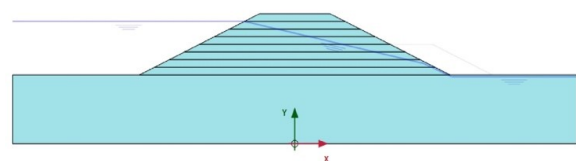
Pattern of phreatic level in road embankment adopted for 7 m high flood water
